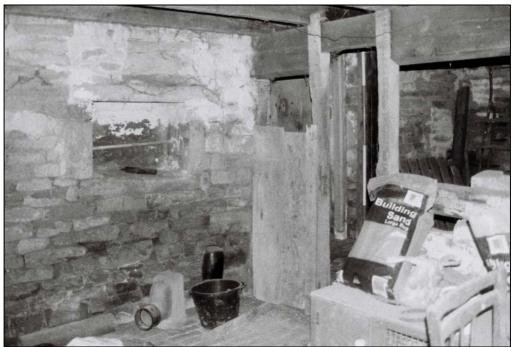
, 14: general view with the recessed keep hole [14] in the southeast wall, looking south
